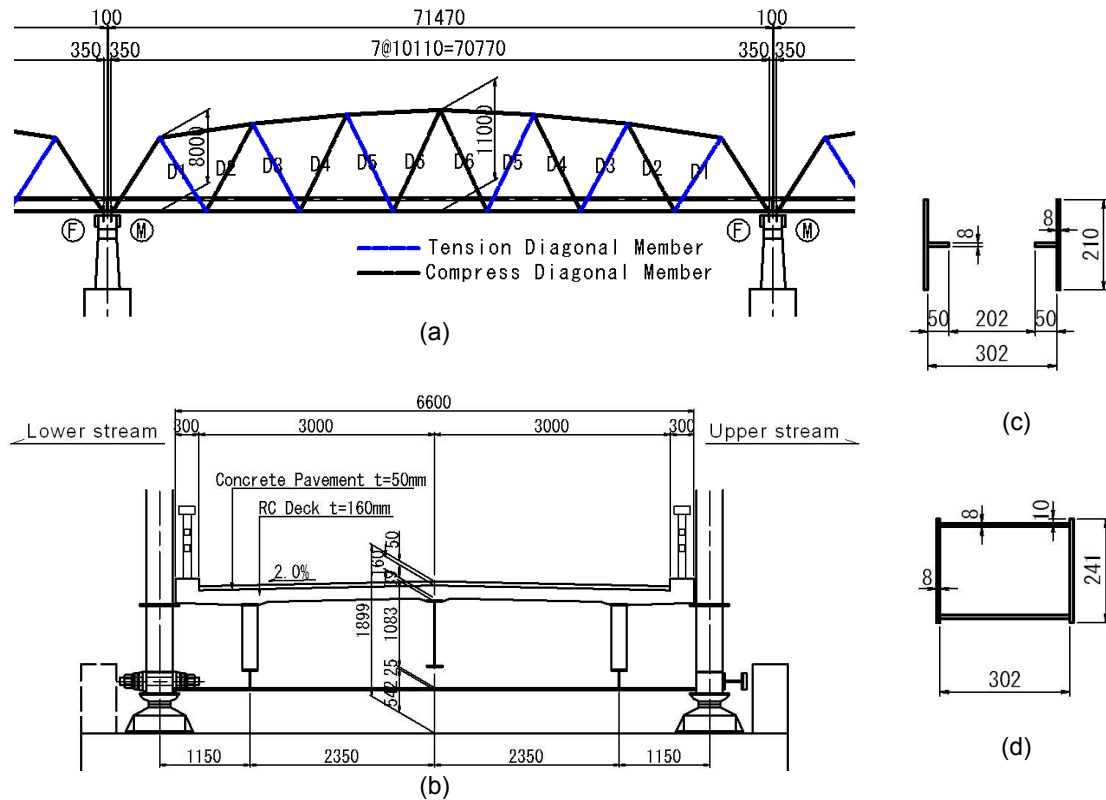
Steel truss bridge investigated: (a) side view of single span, (b) cross section of the bridge, (c) cross section of tension diagonal member, (d) cross section of compression diagonal member. Unit [mm].
